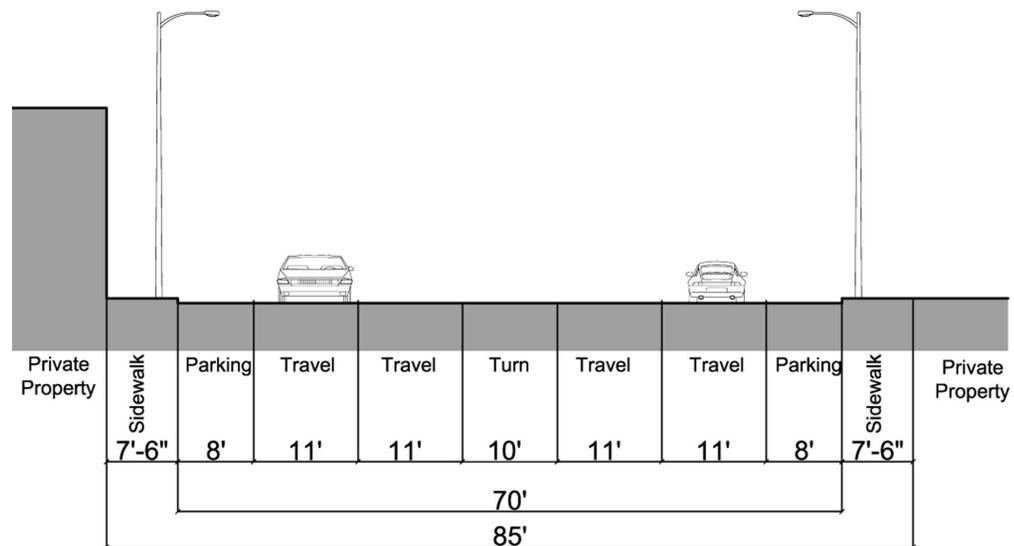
Maximum existing cross-section for Garfield Avenue.
